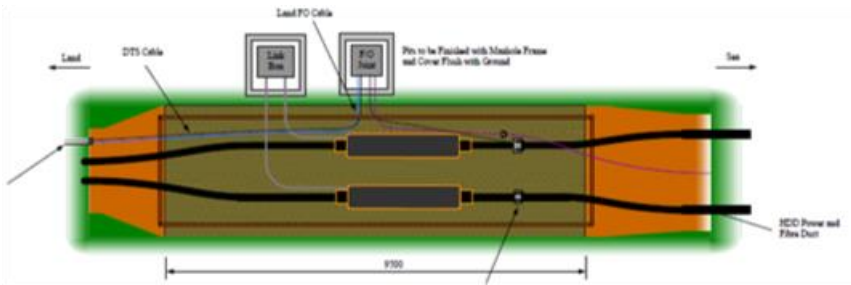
Typical transition joint bay lay-out for HVDC cable system comprising of 2 DC cables and a Fibre Optic (without MR cable)
